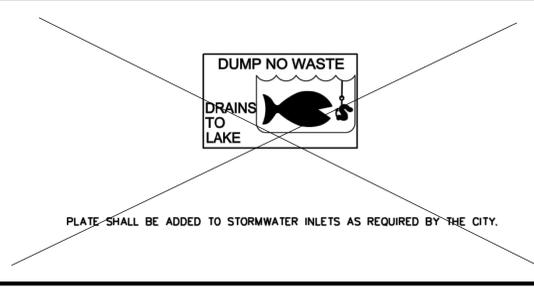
PLATE SHALL BE ADDED TO STORMWATER INLETS AS REQUIRED BY THE CITY.
